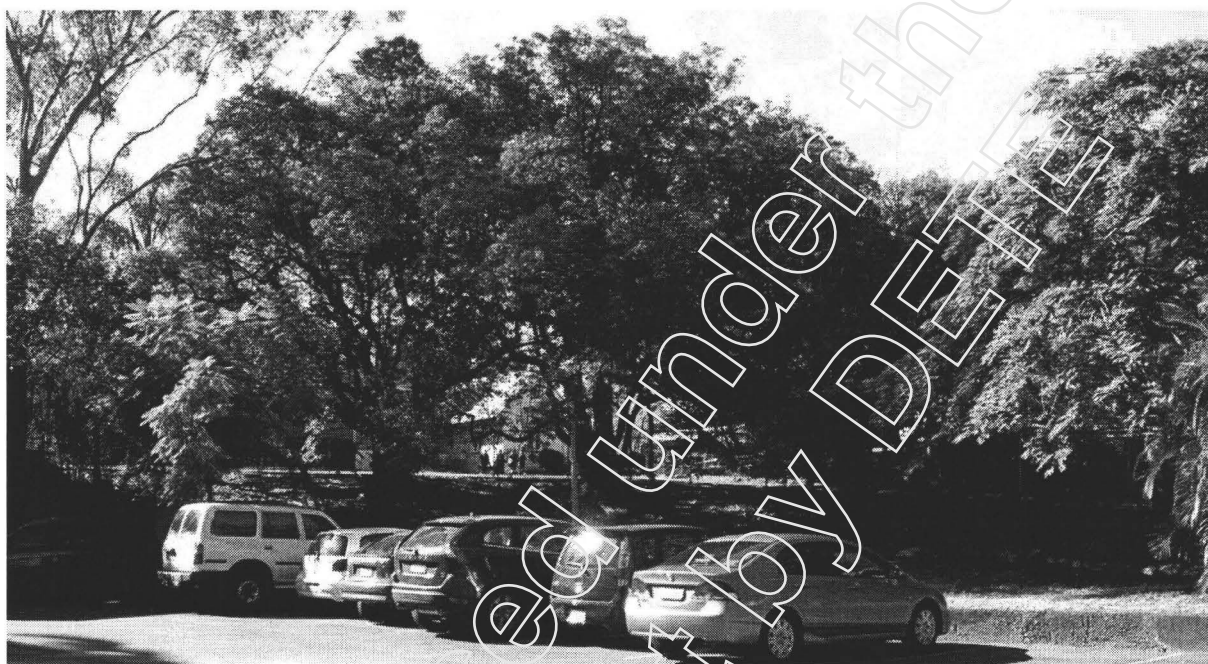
Options 1 and 2 - proposed site of two storey classroom block. The building could be built into the bank.
